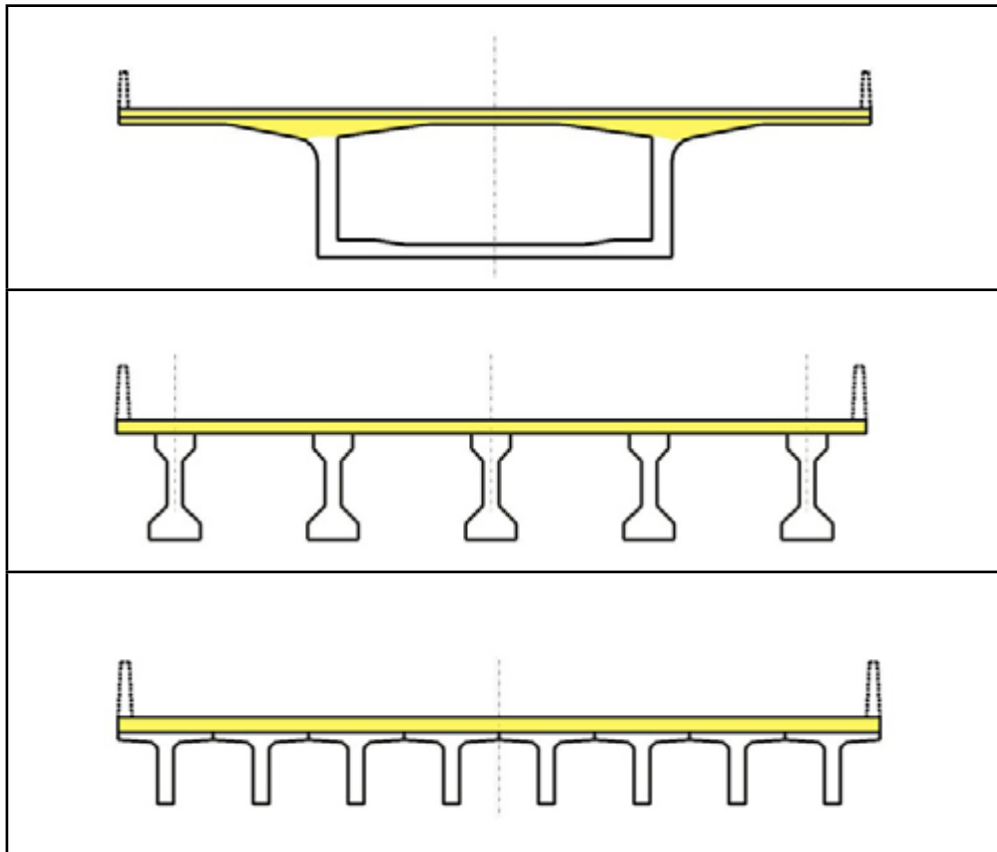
Reinforced Concrete Deck (Highlighted)
